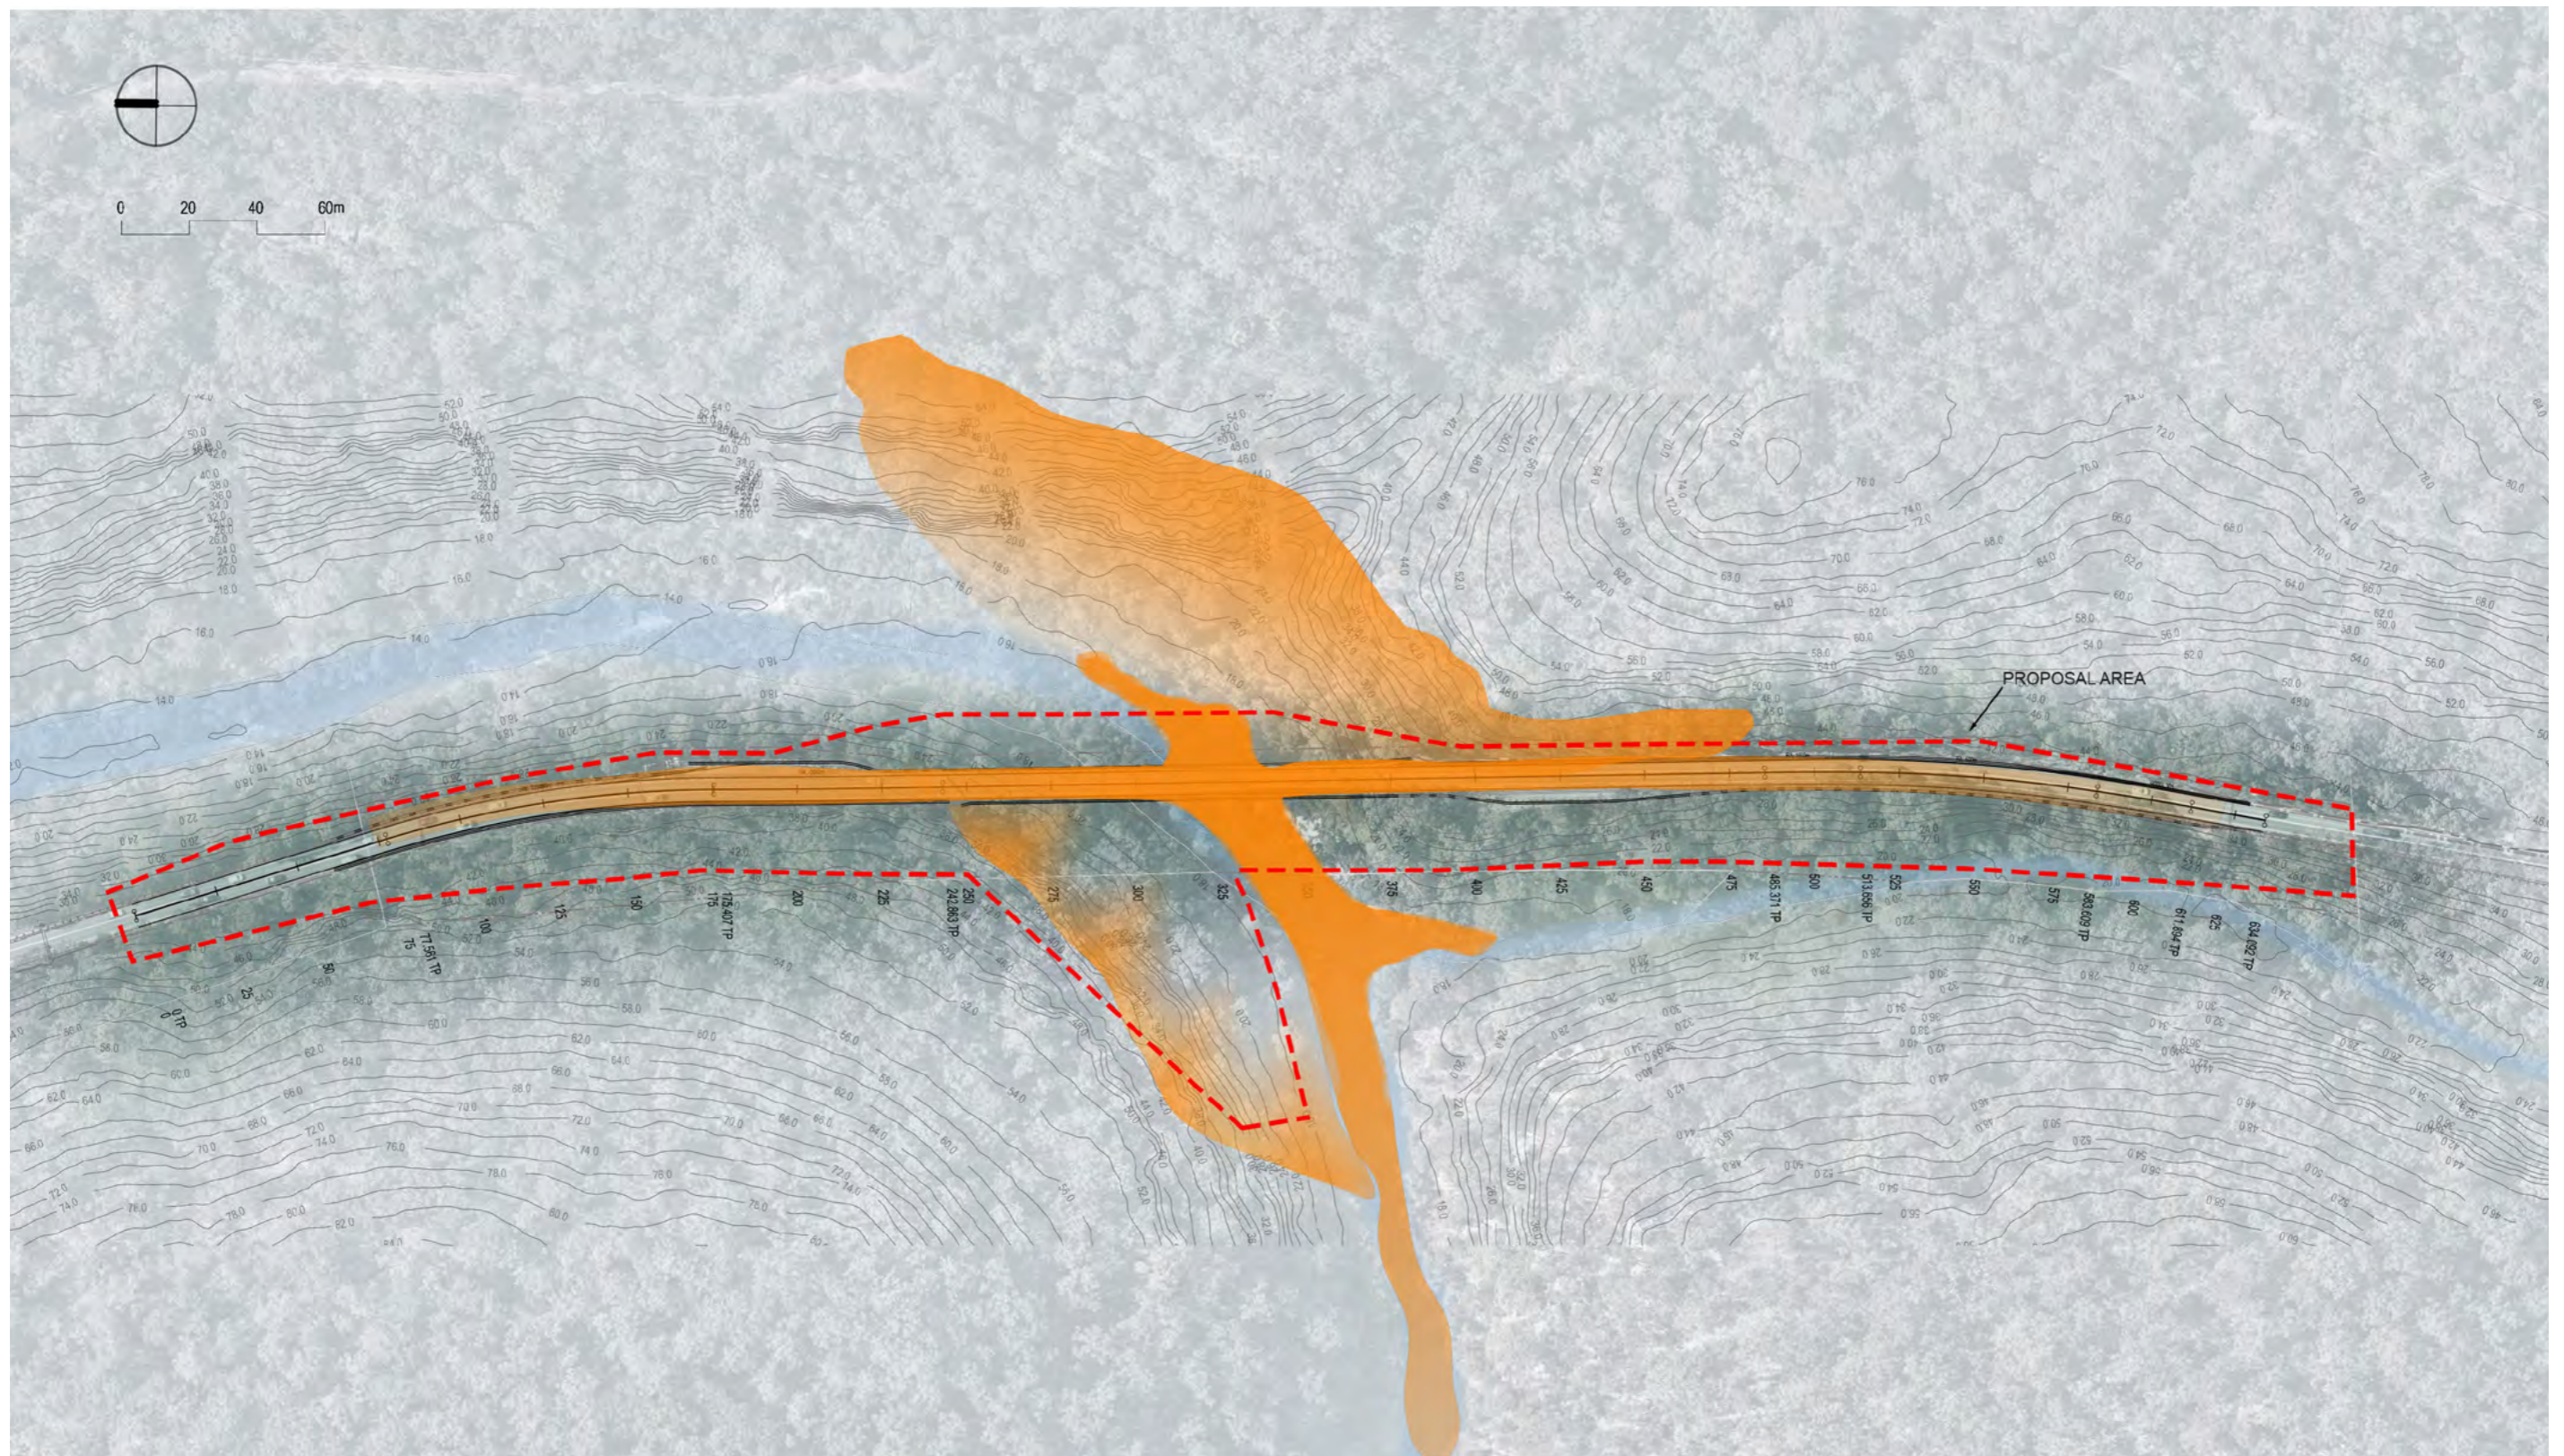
Plan illustrating the visual impact assessment of new bridge
